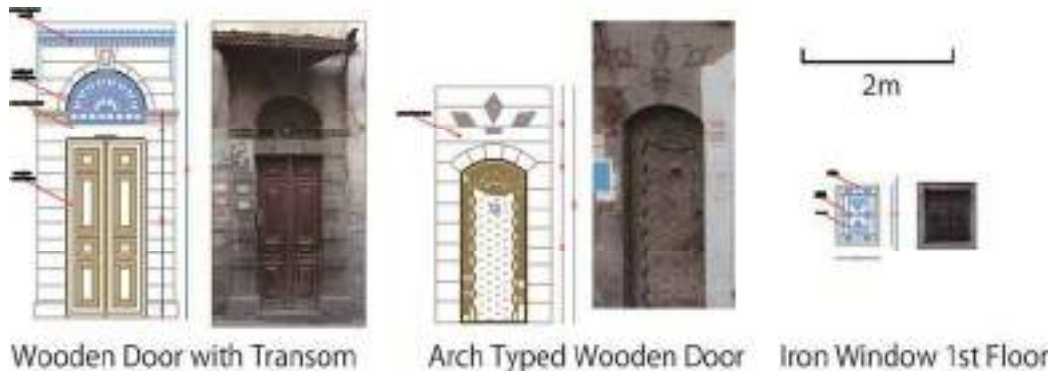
Examples of Elements (Doors and Windows on the 1st Floor)
